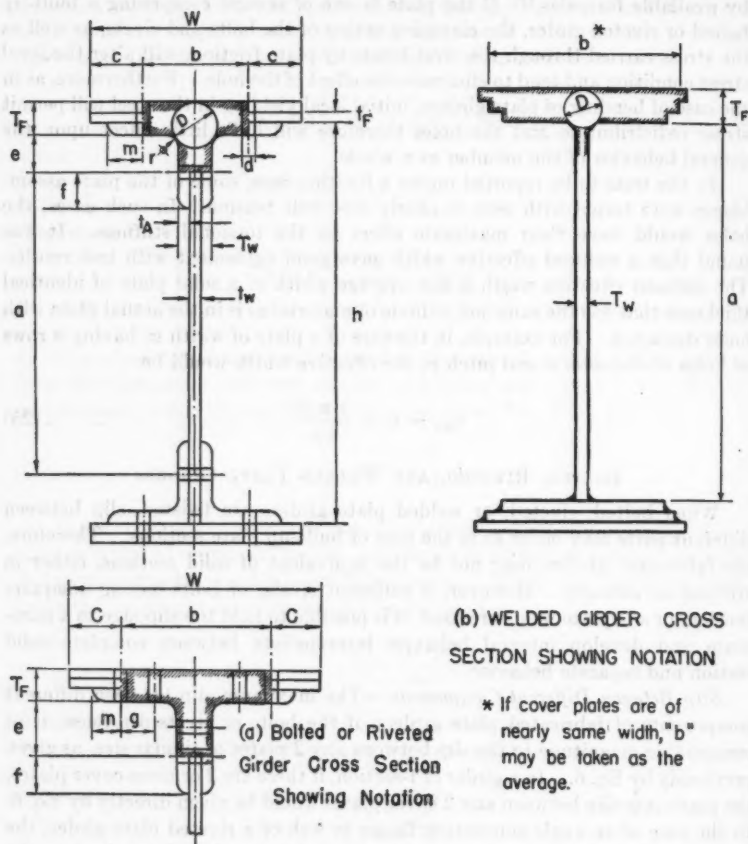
NOTATION FOR BUILT-UP GIRDERS
